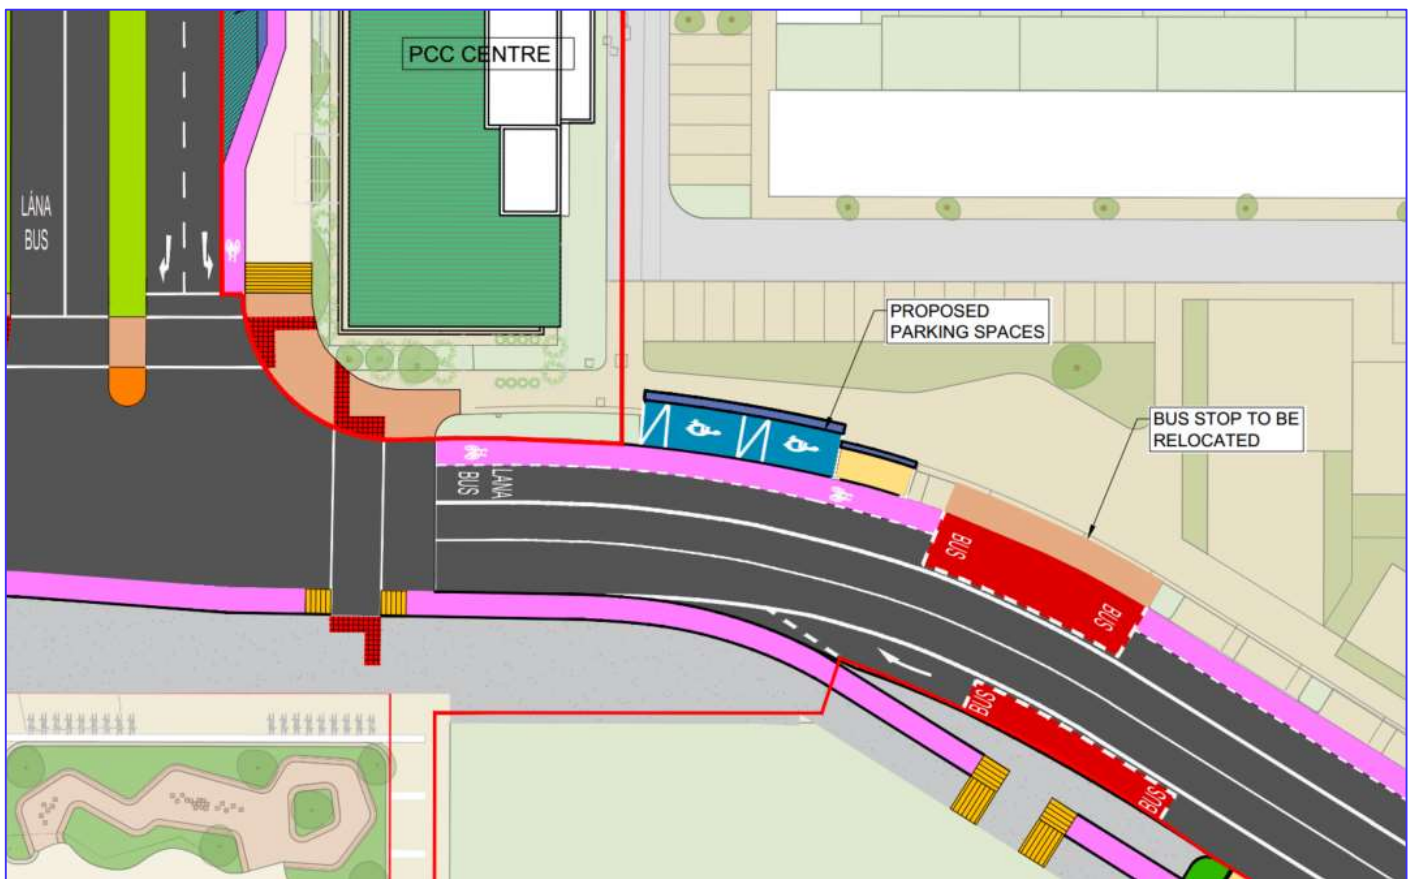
Option 3: Parallel Car Parking on Adamstown Avenue
